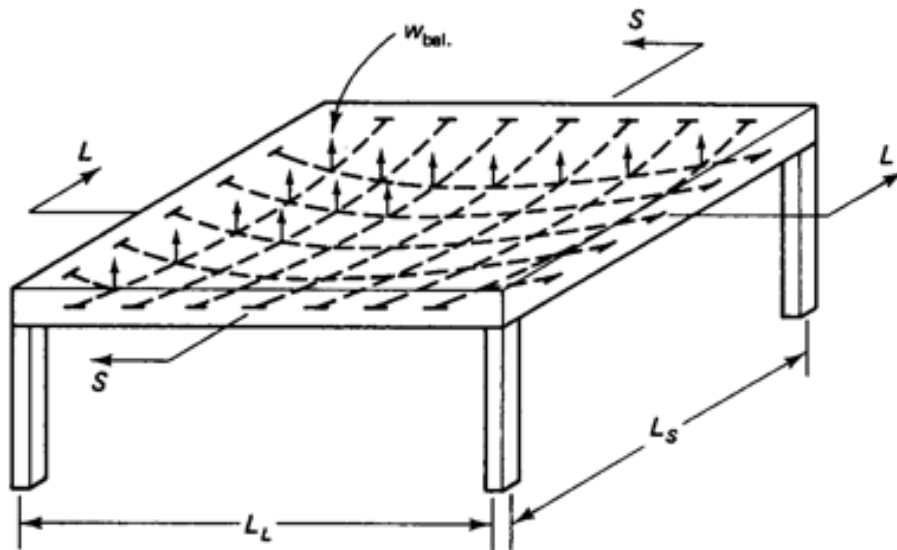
Balancing loads in two-way prestressed panel: Three-dimensional view (Source: Nawy, 2009)
